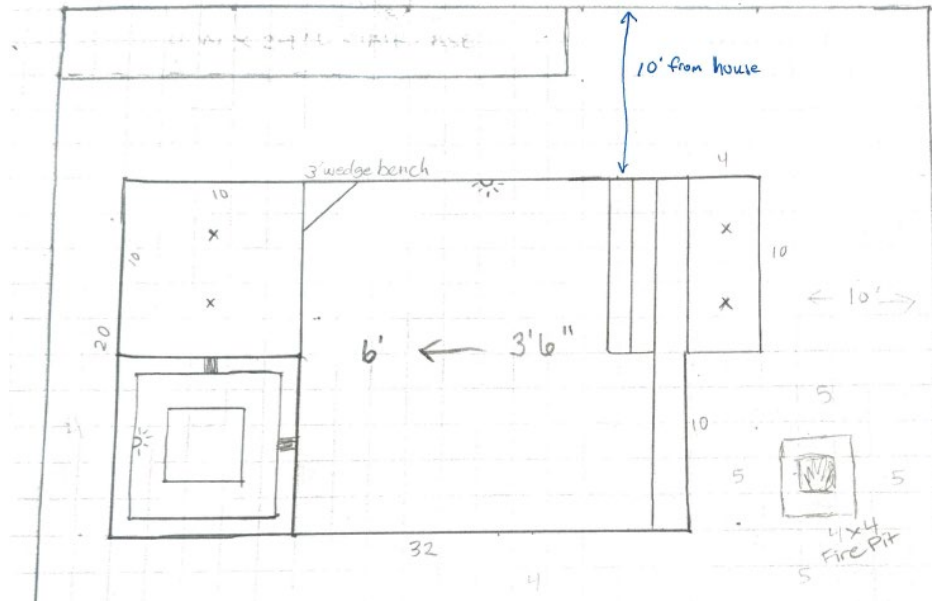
Proposed Pool, Hot Tube, and Fire pit Site Plan
